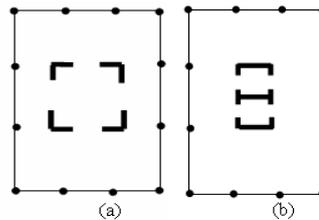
Arrangement of shear walls and braced frames-not recommended. Heavy lines indicate Shear walls and/or braced frames
